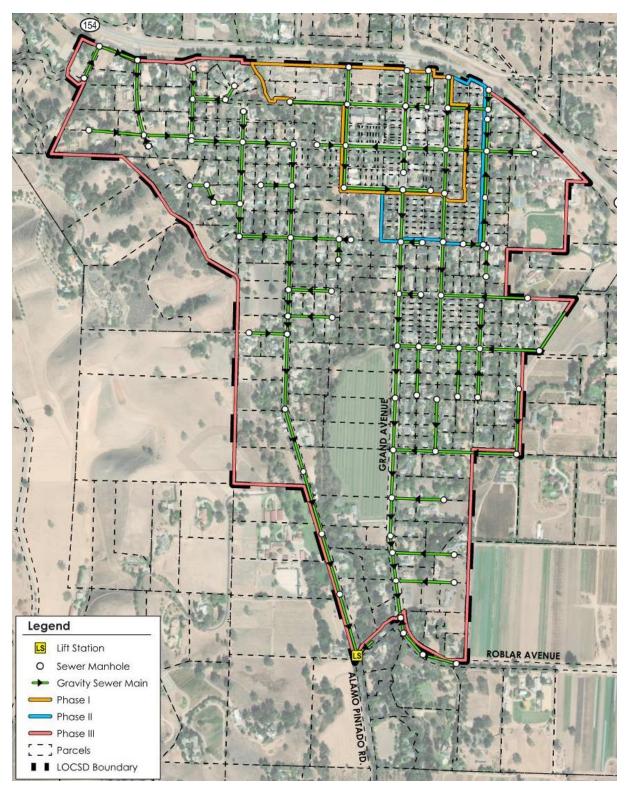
Los Olivos Preliminary Gravity Sewer Collection Layout
